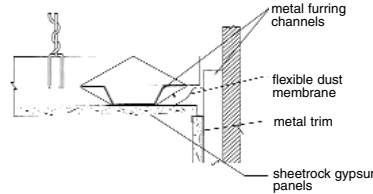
Perimeter relief of suspended ceiling at exterior wall.
